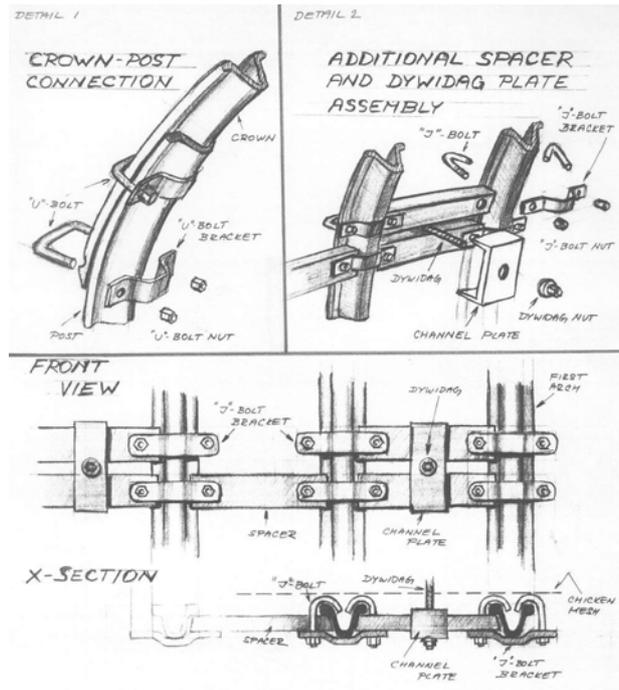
Connecting channels and 'J' bolts of yielding arch
